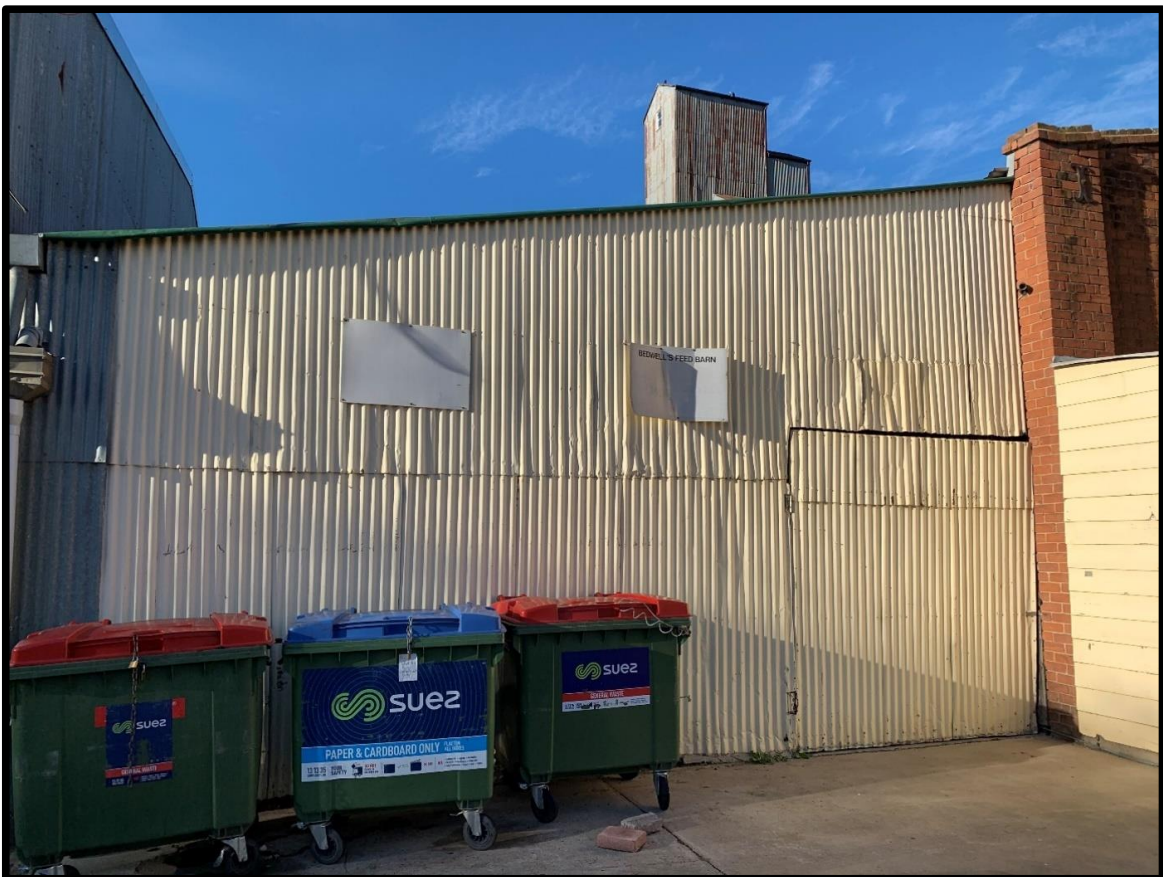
South-Western Elevation of Existing Awning – To be Demolished for New Walkway
